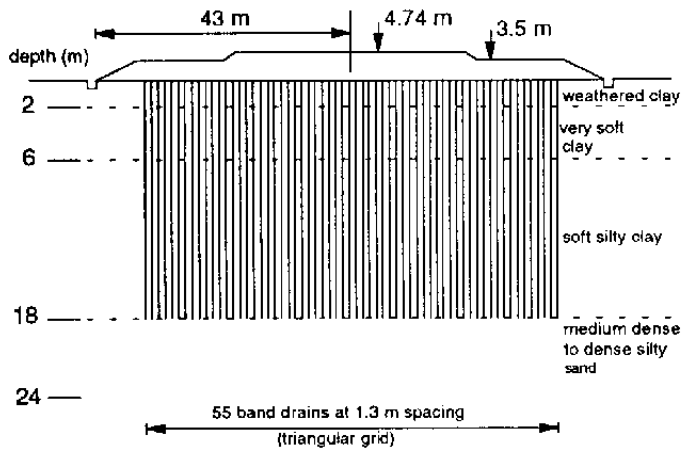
Cross section through centerline of embankment with sub-soil profile
